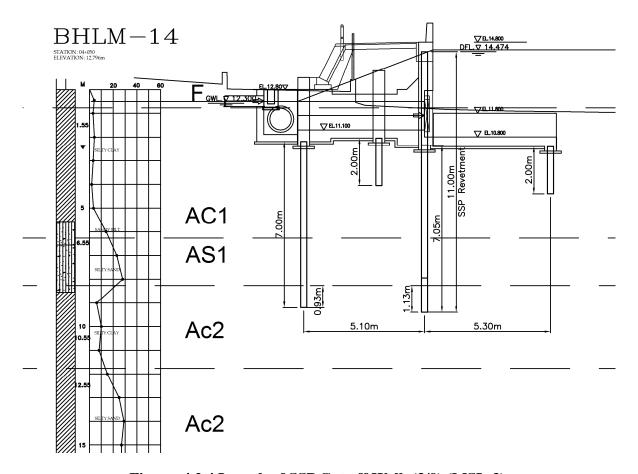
Length of SSP Cut off Wall (3/9) (MSL-3)
